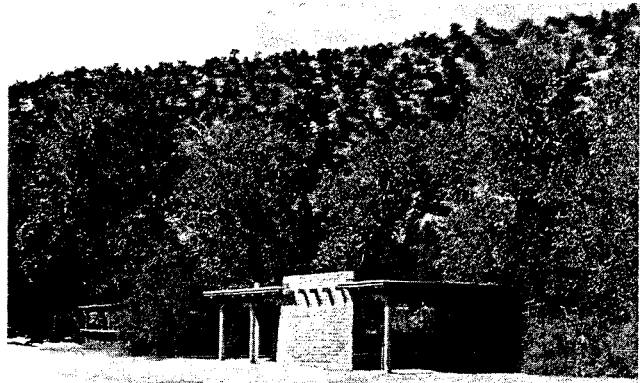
PICNIC RAMADA, CONSTRUCTED OF STABILIZED ADOBE BRICKS AT NAMBÉ FALLS RECREATION AREA.
